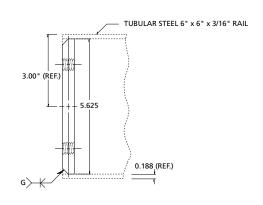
DETAIL POST ASSEMBLY 8 x 6 SIDE ELEVATION Q2
